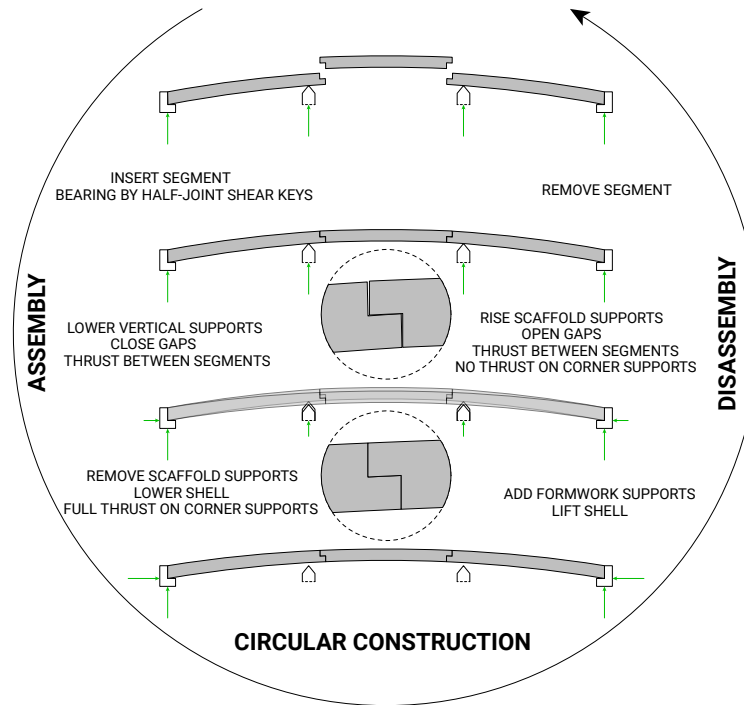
Circular assembly, disassembly, and reuse of a segmented concrete shell using telescopic formwork props thanks to dry half-joint connections.
